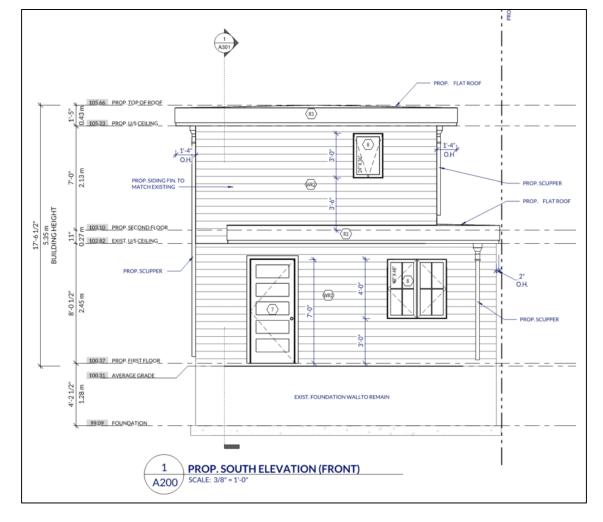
South Elevation (Front) proposed via Subject Application A2025-057.
